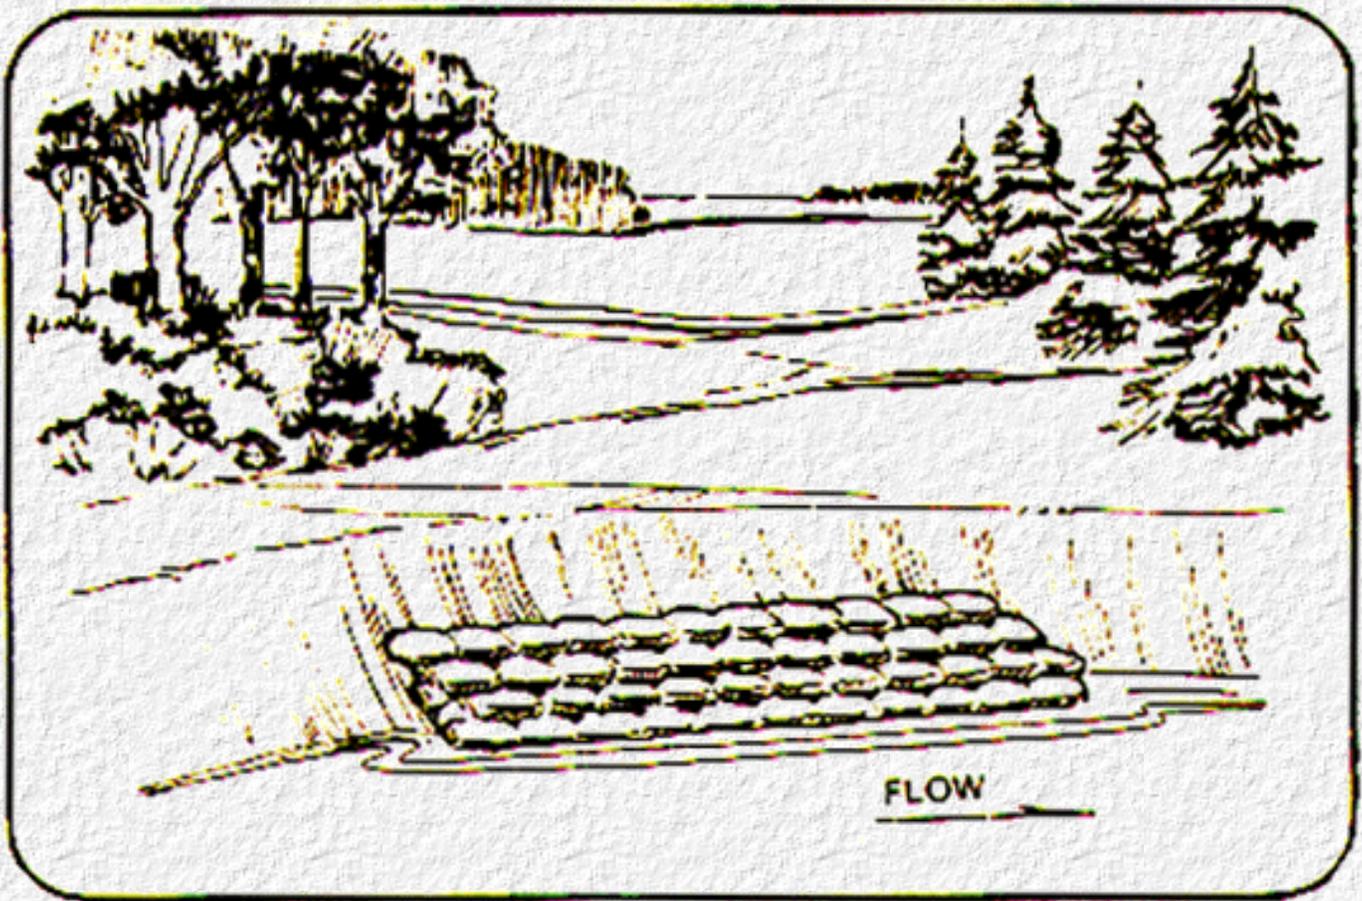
Typical Sand-Cement Bag Revetment (after Keown, 1983)
